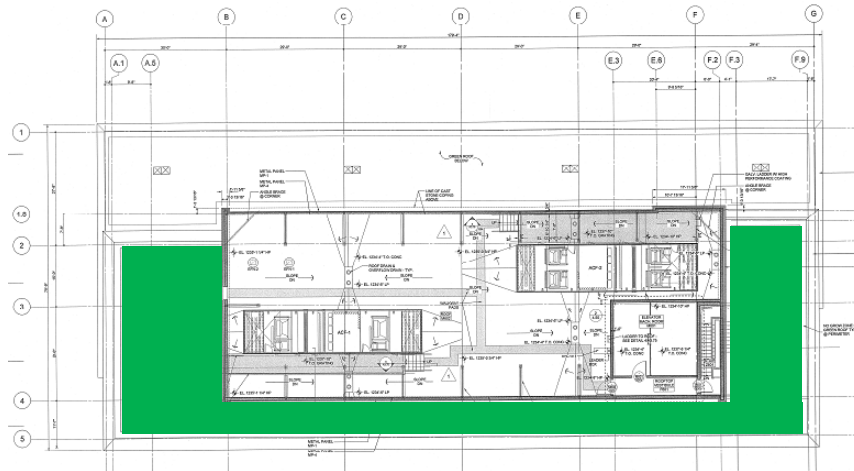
Green Roof on 5<sup>th</sup> Floor
